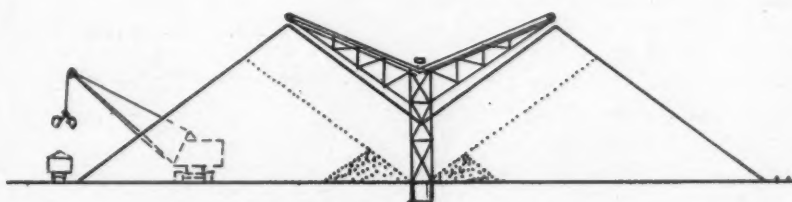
Extra track is a feature of this plant layout sketch developed to meet extra storage demands of plant
